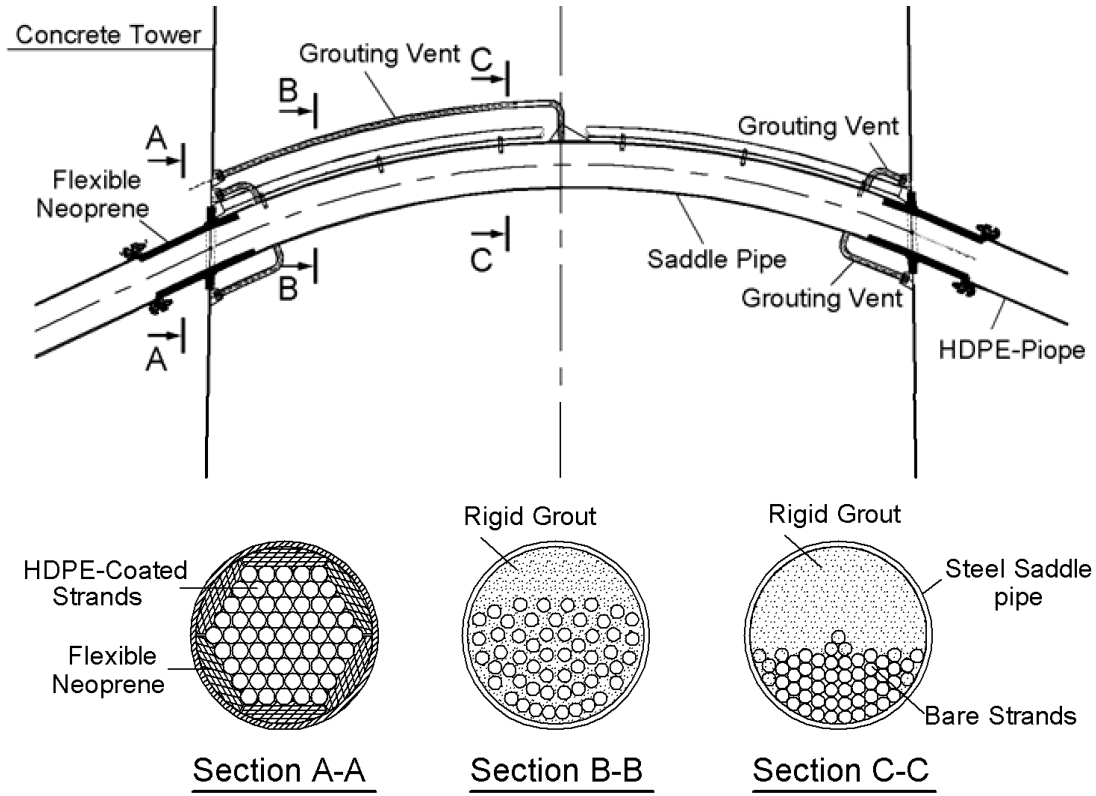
Steel saddle anchorage at pylon head using a steel saddle and cement grout.
